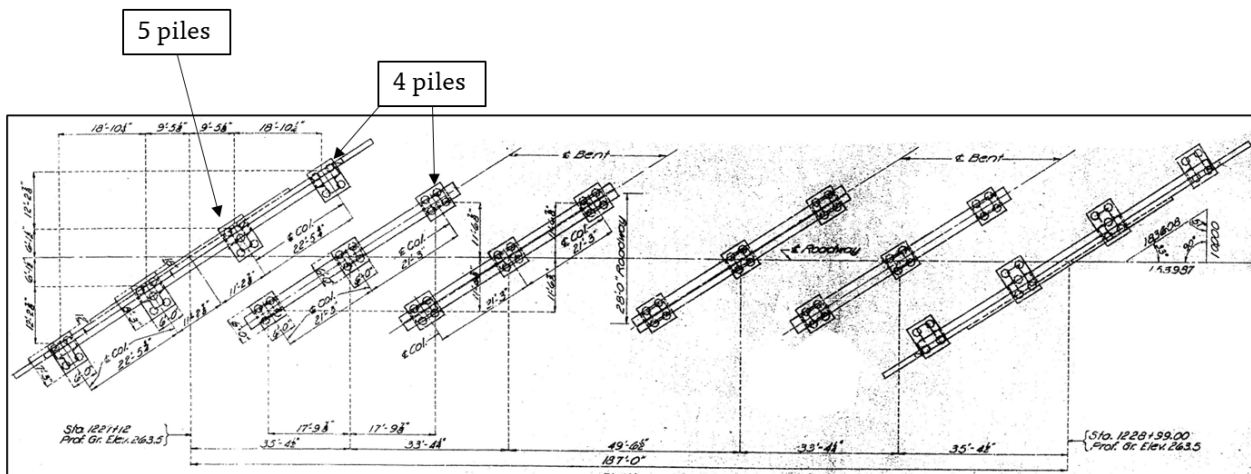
Plan showing foundations (bents and piles) of the L472 Bridge
